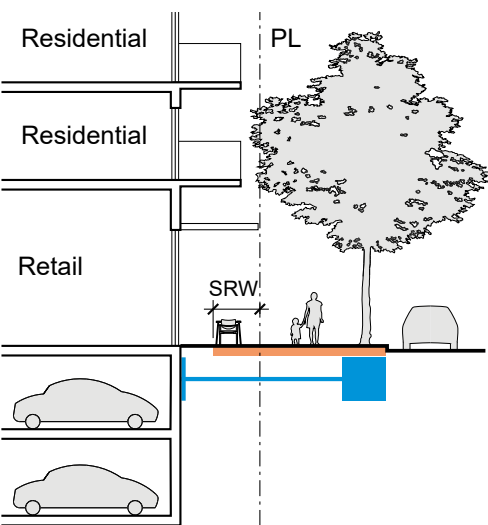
The front yard accommodates a statutory right-of-way for sidewalk widening and underground parkades are set back to accommodate GRI in the public right-of-way.
